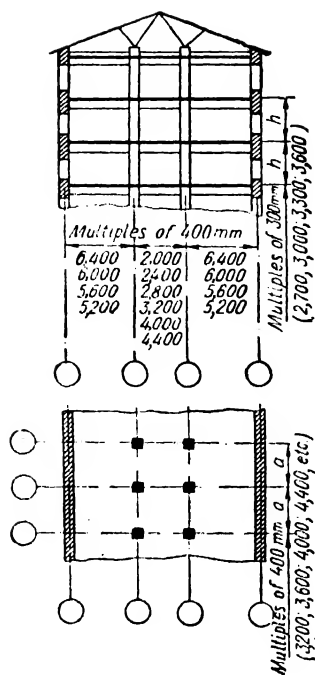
Unified dimensions for multi-storey apartment houses and civic buildings
